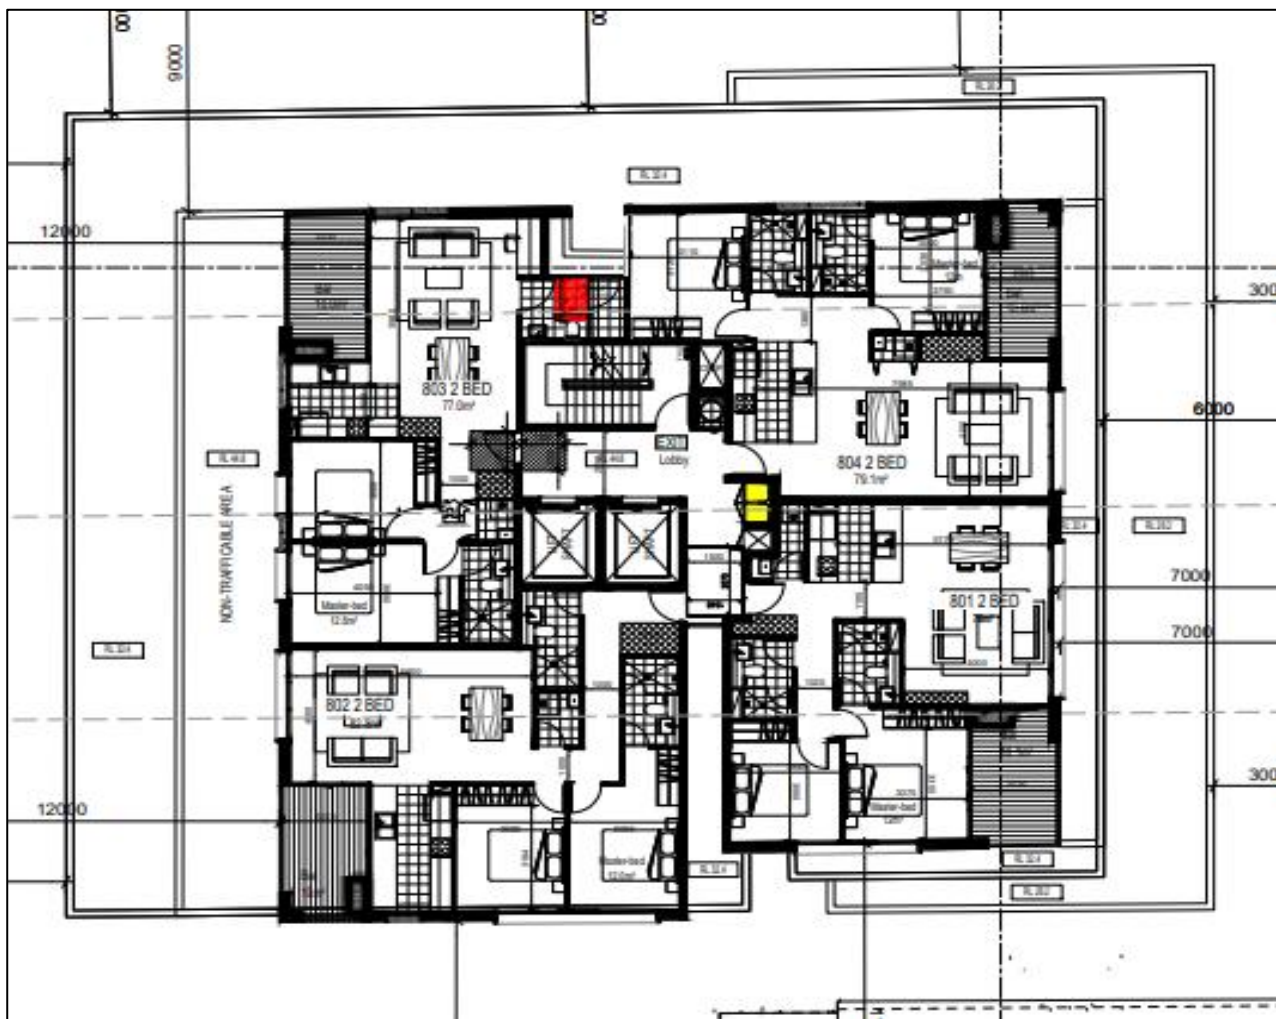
Extract of applicants submitted Level 8 Floor Plan.
